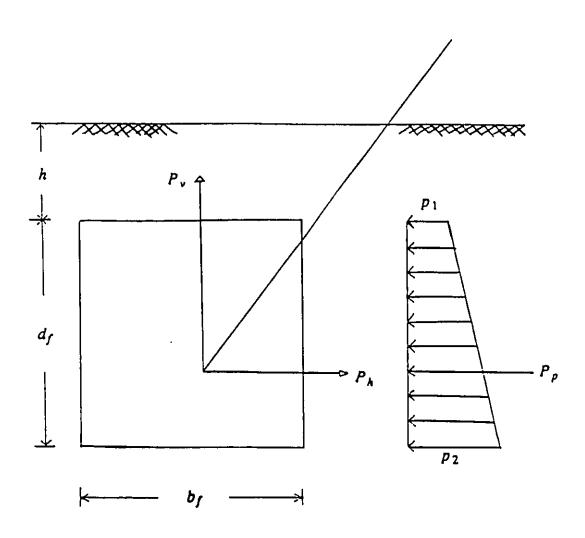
DEADMAN ANCHORAGE : FORCES ACTING ON THE ANCHORAGE BLOCK
